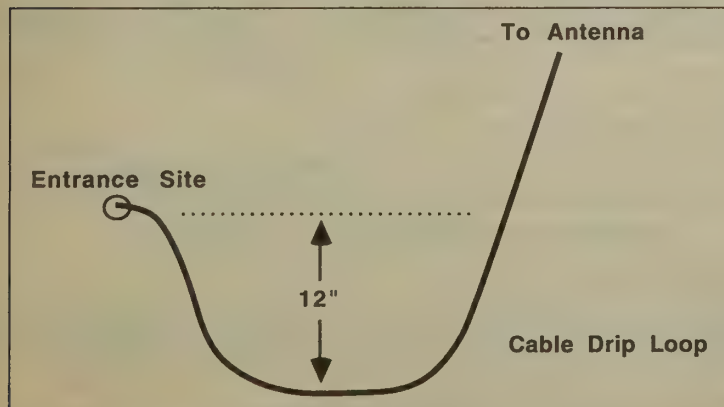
It is necessary to install a drip loop to prevent water damage.
